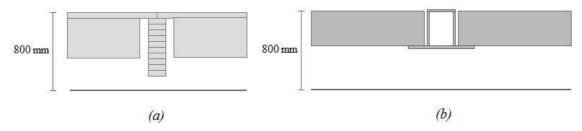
Floor structures in the concepts and the reference building, (a) the floors in the concepts (b) floors in the reference building.
